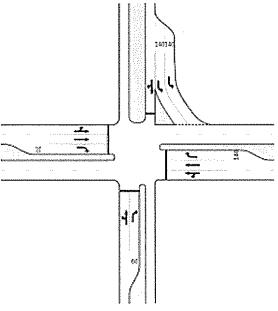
"Precinct 1 and 2" Intersection Layout - Intersection 6
